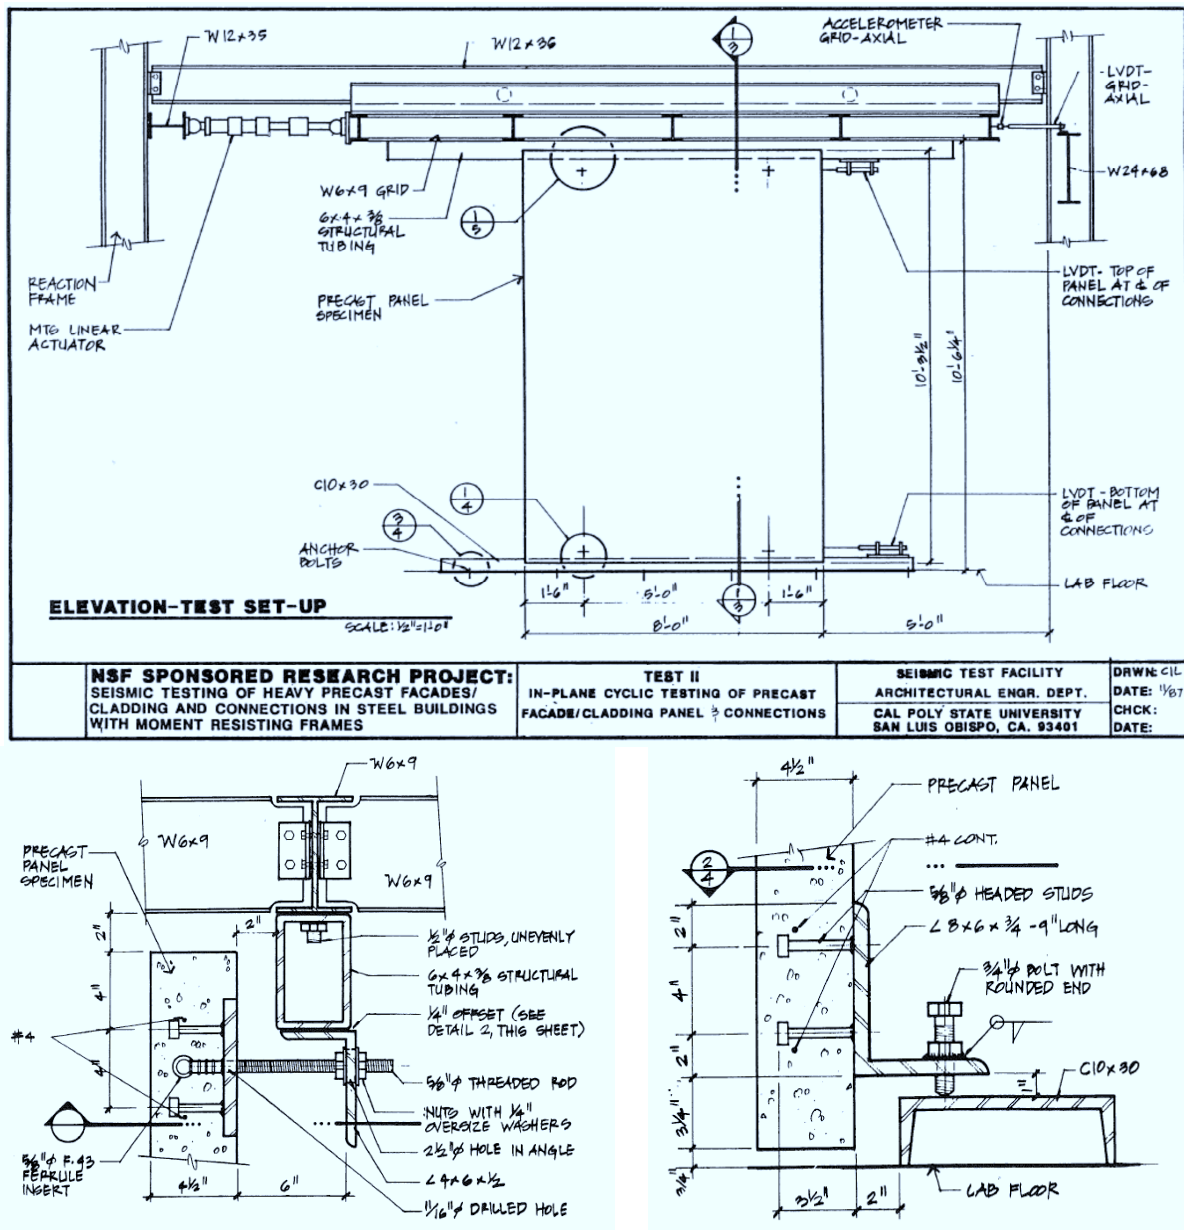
Cladding panel test setup (top), cladding specimen connection details – top tie-back connection (bottom left), bottom bearing connection (bottom right) (Rihal, 1989)
